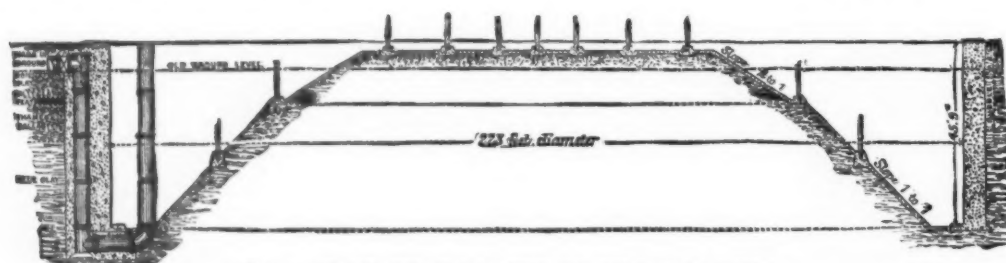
TRANSVERSE SECTION OF CONCRETE TANK
